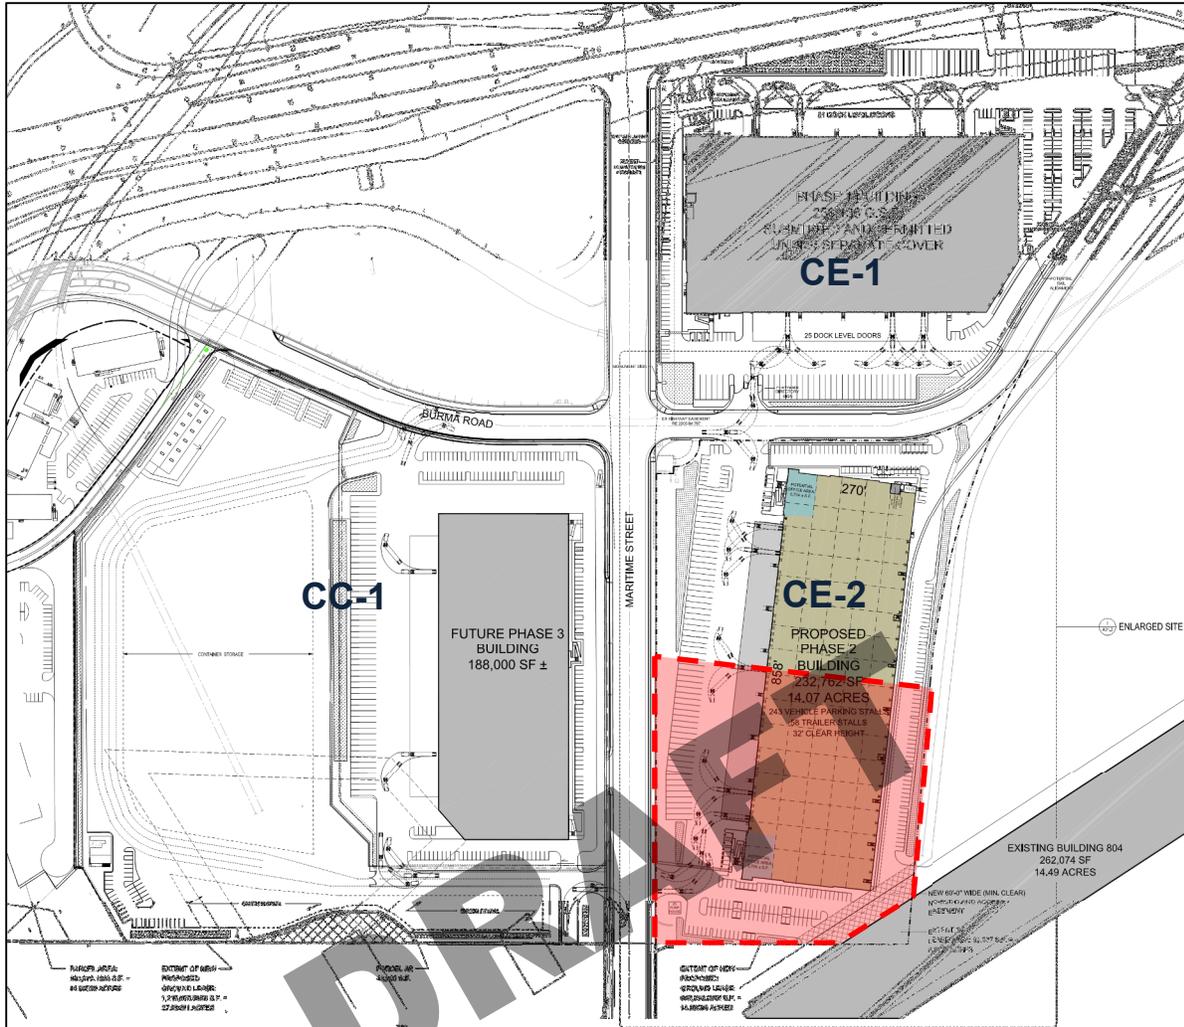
Site Plan – Overall Site showing building and Good Eggs’ lease area subject to this Plan
